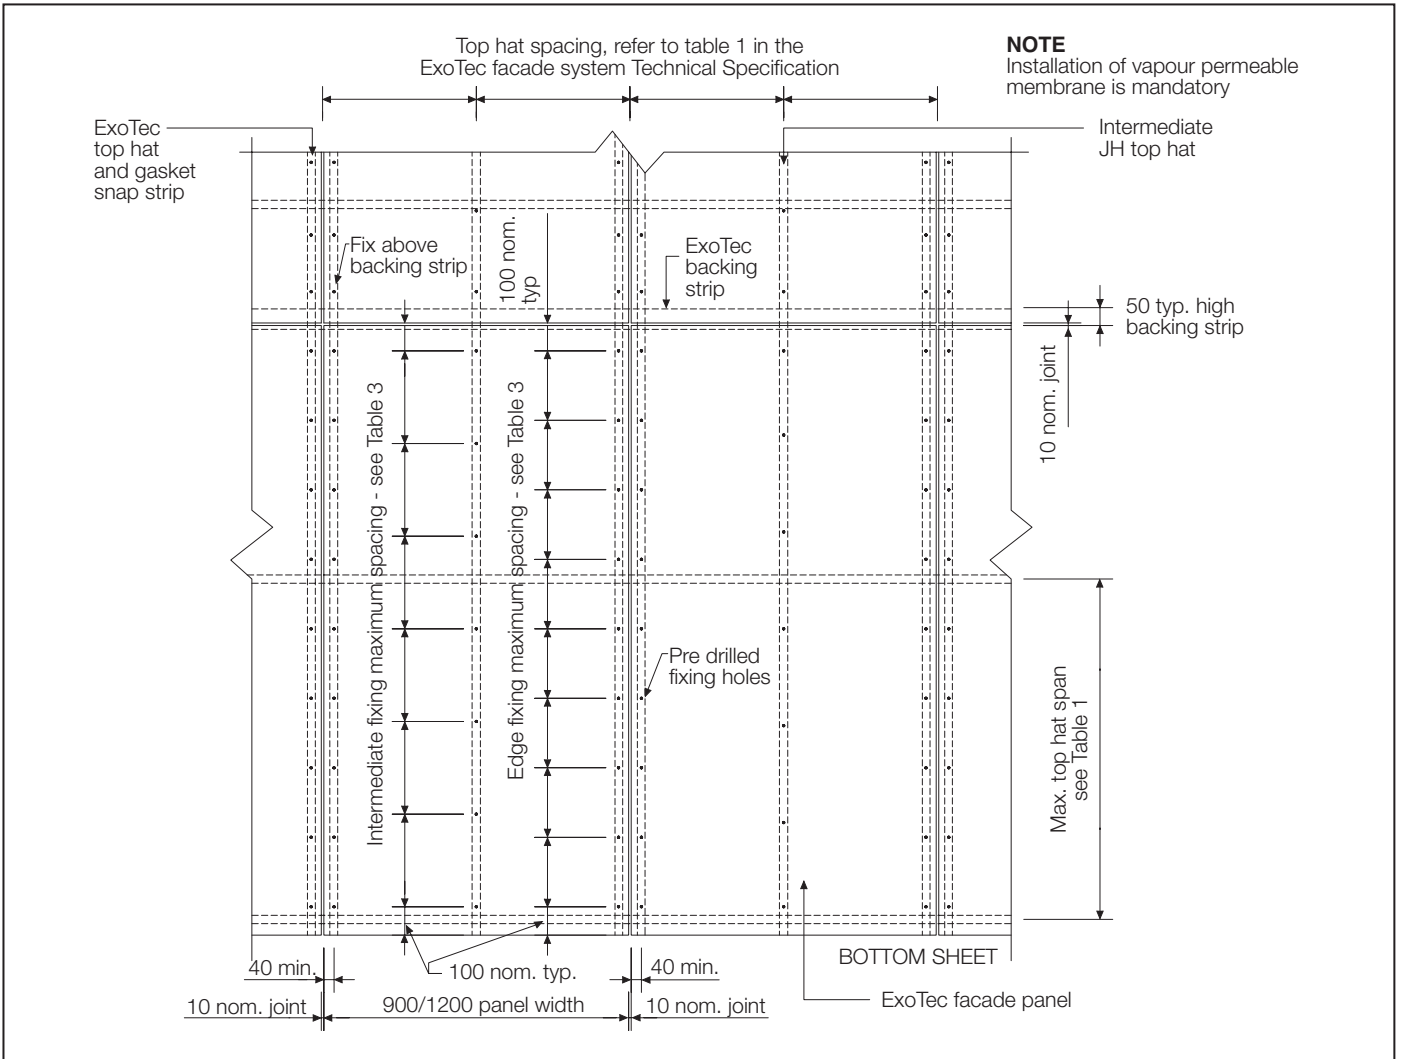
TYPICAL PANEL AND FRAMING LAYOUT
